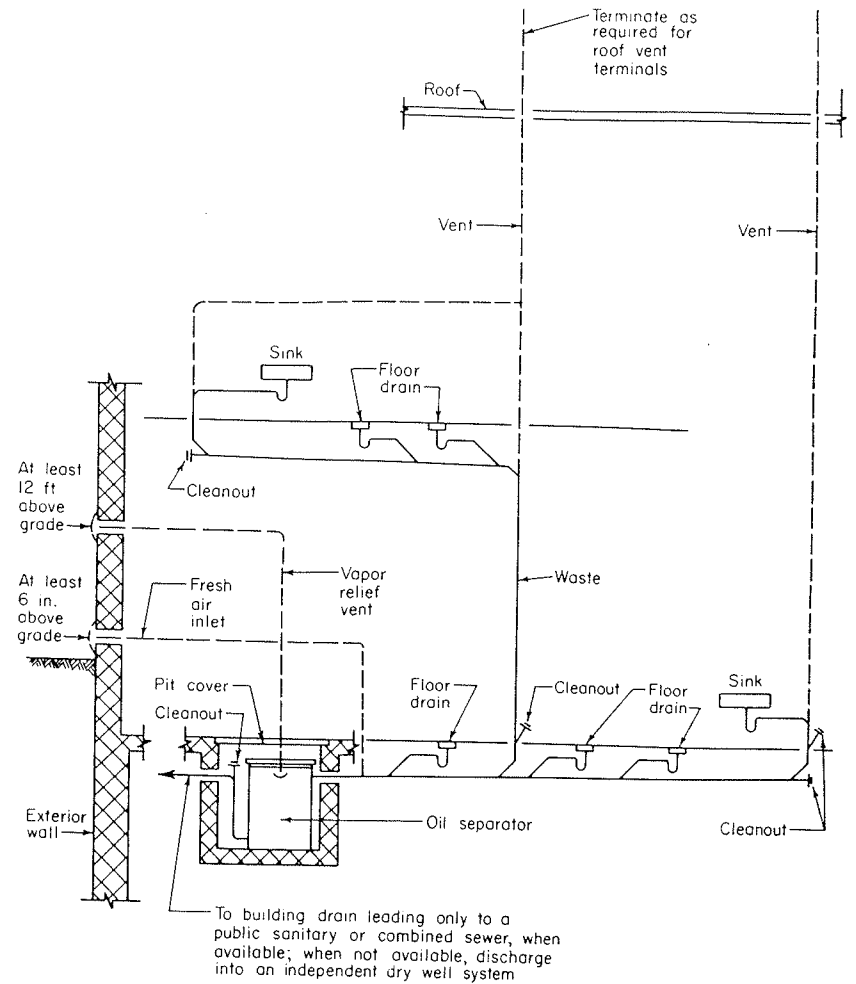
Combination waste and vent arrangement for volatile, flammable oil waste drainage.
